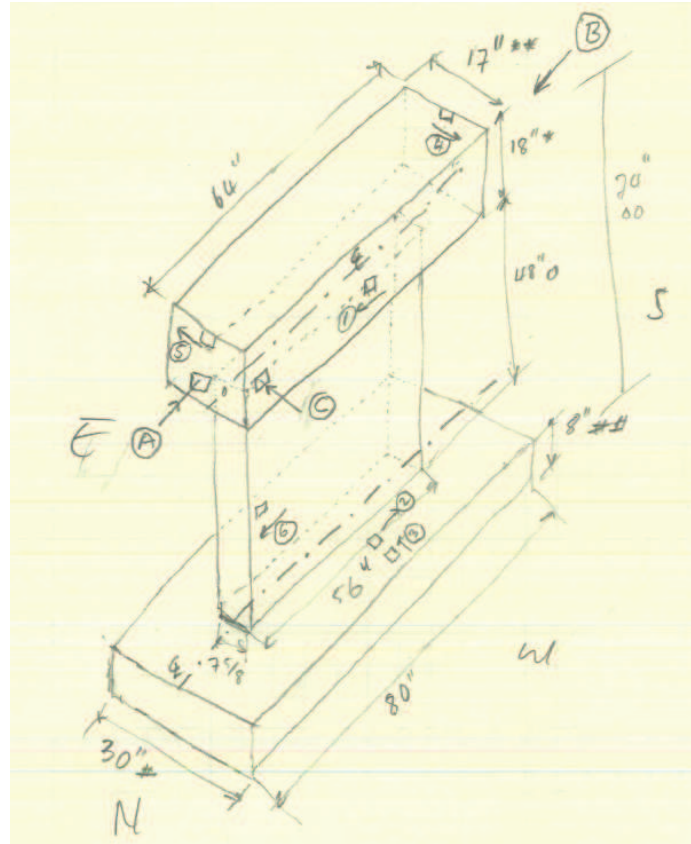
Free-hand sketch of the masonry wall specimen by the author (not to scale)
